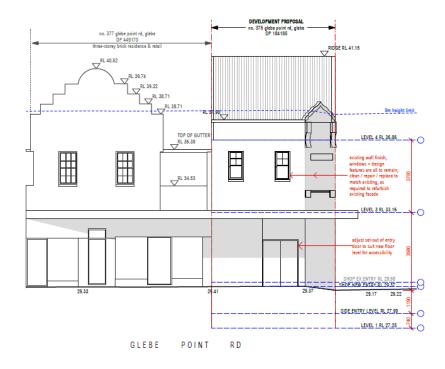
Proposed front south-west elevation (Glebe Point Road)
